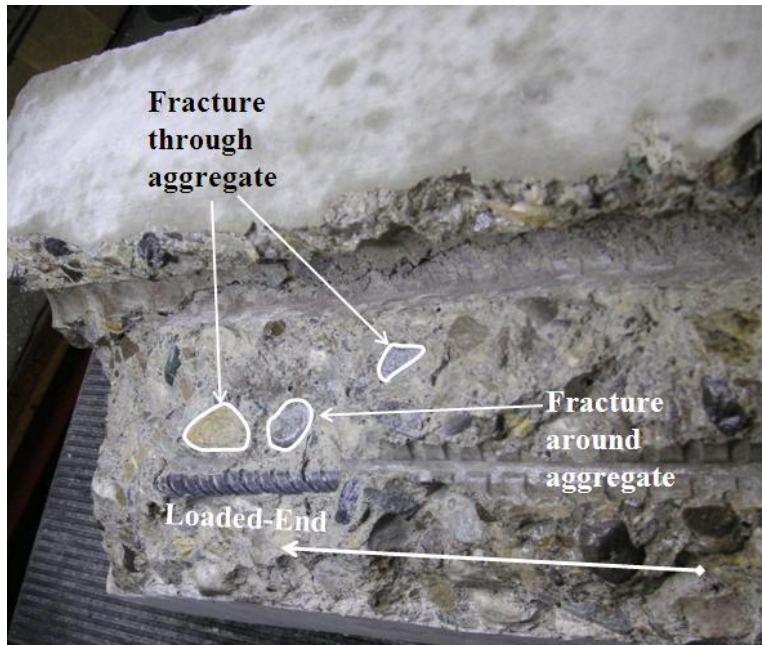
Main failure planes through concrete cover (dissected BE-NAC-30-375A)
